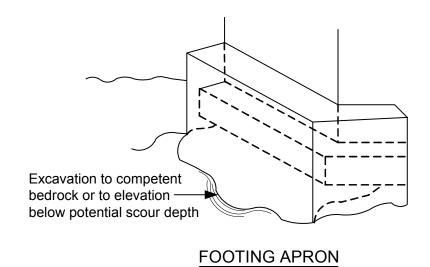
Concrete Footing Apron on a Masonry Arch Bridge
